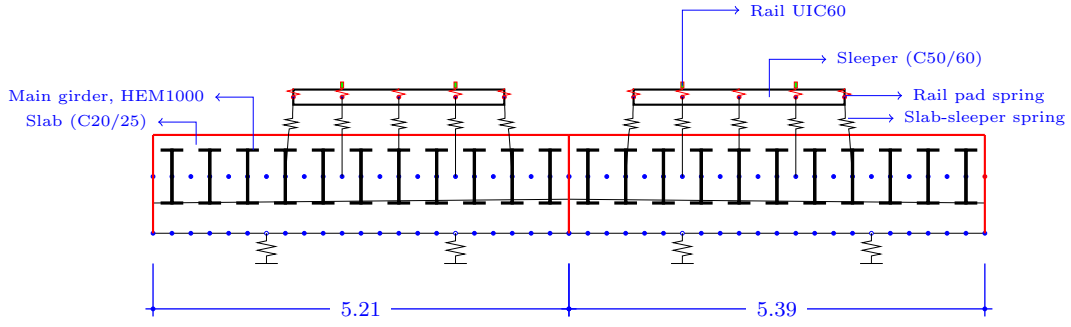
Cross section of the finite element model of the Erfttal-Brücke railway bridge
